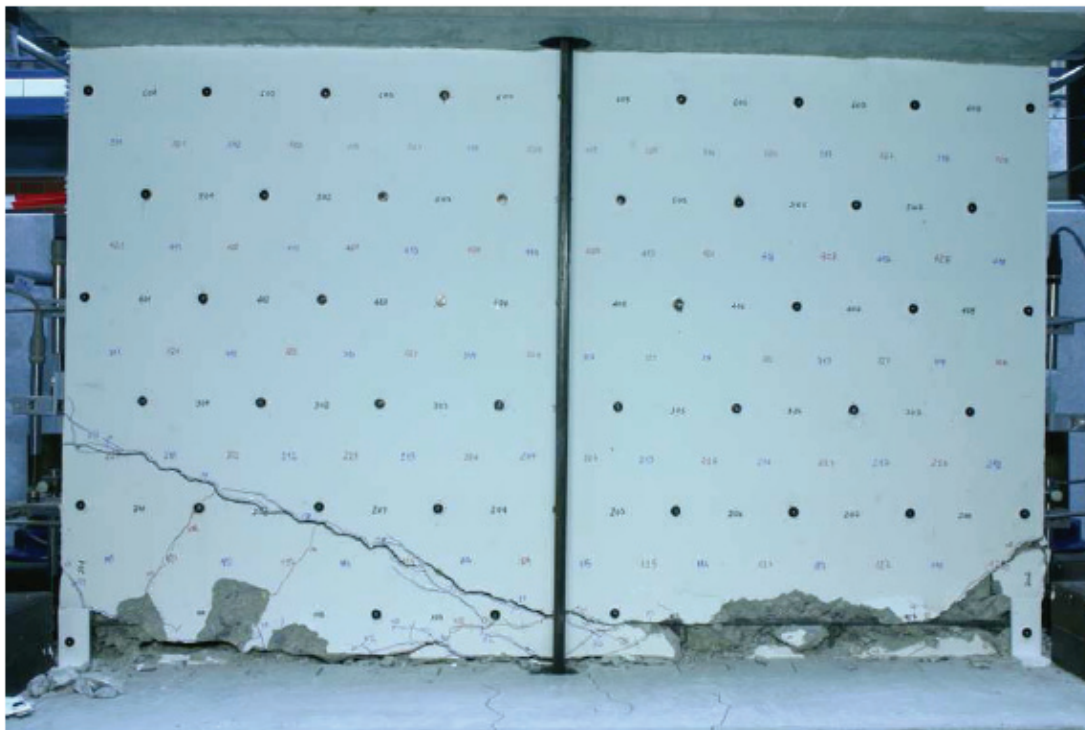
Cracking pattern for wall M1 tested by Greifenhagen et al. (2005) at reinforcement fracture
